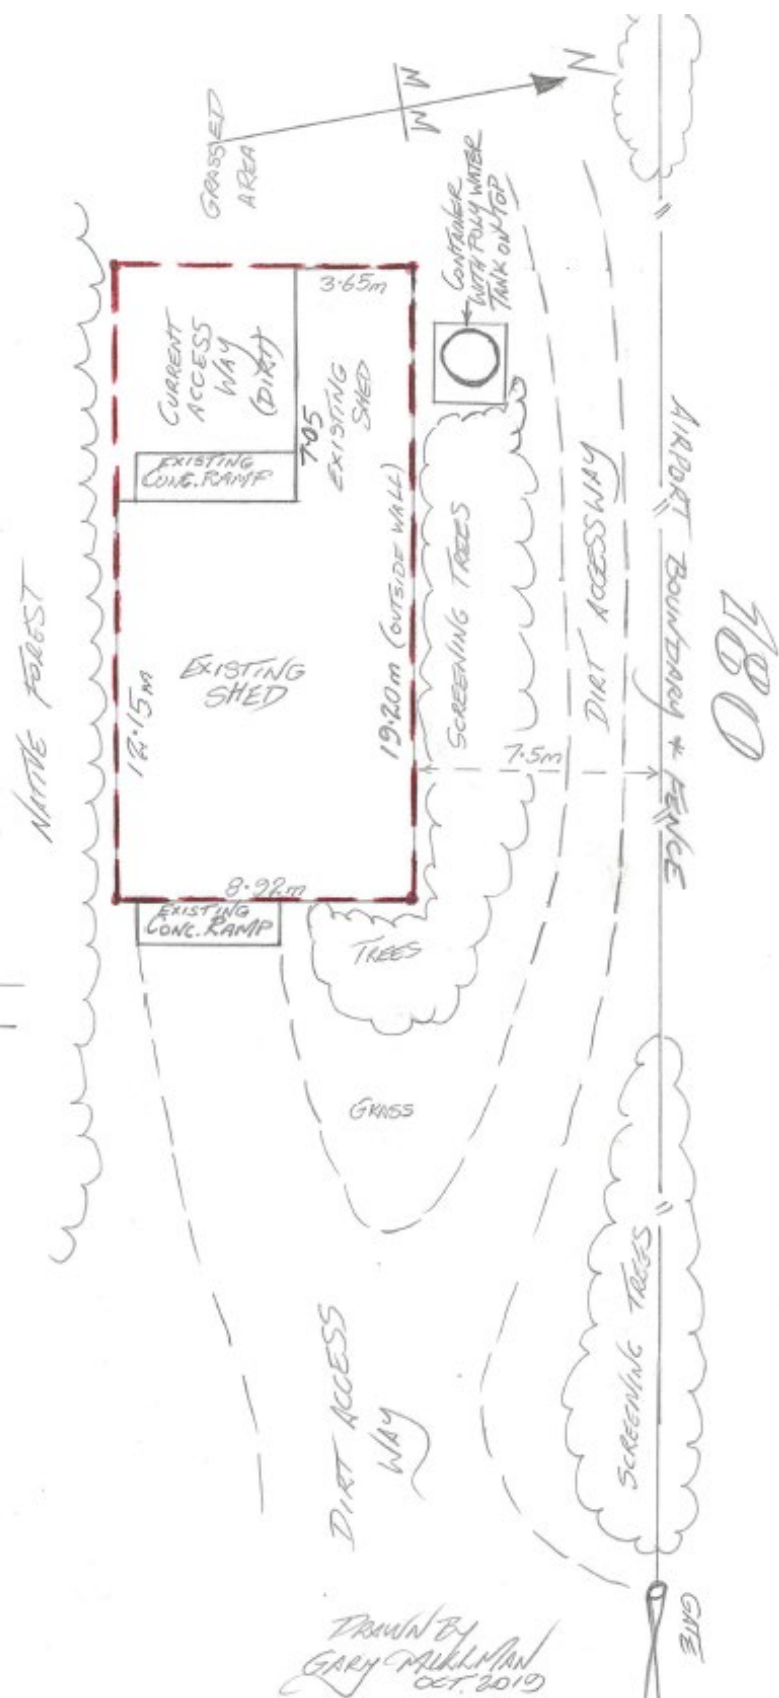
Site Plan with proposed new shed footprint. Source: LHIB.
